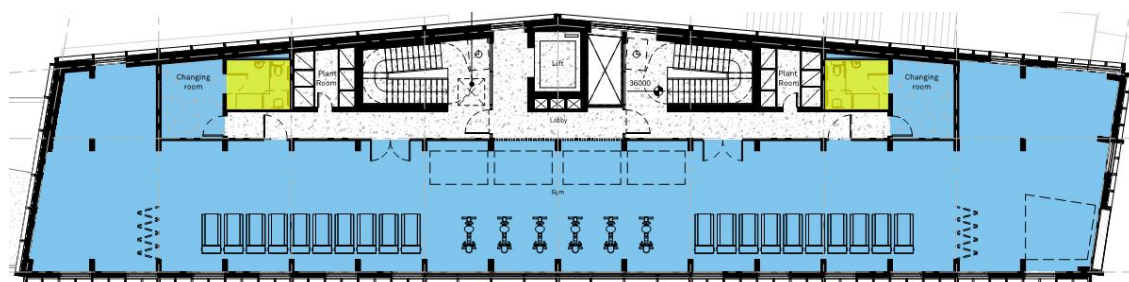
Proposed Second Floor with accessible showers indicated in Yellow
